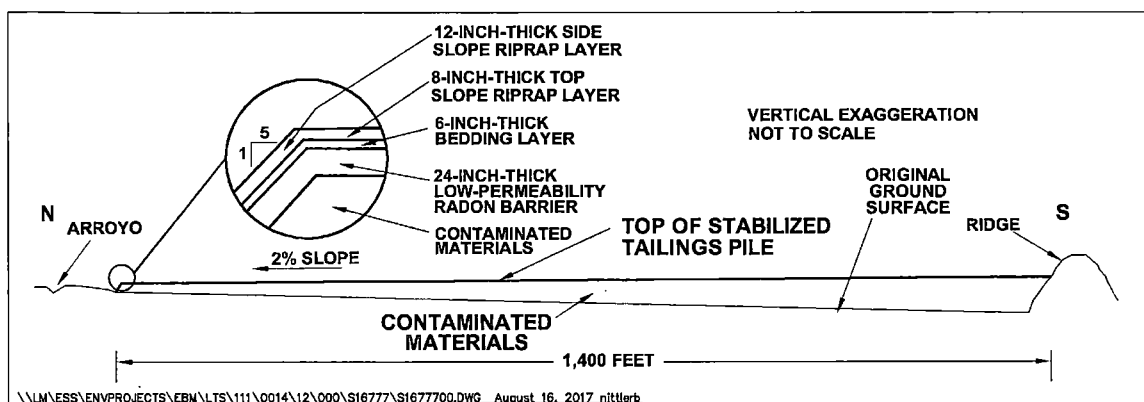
Typical North-South Cross Section of the Mexican Hat Disposal Cell
